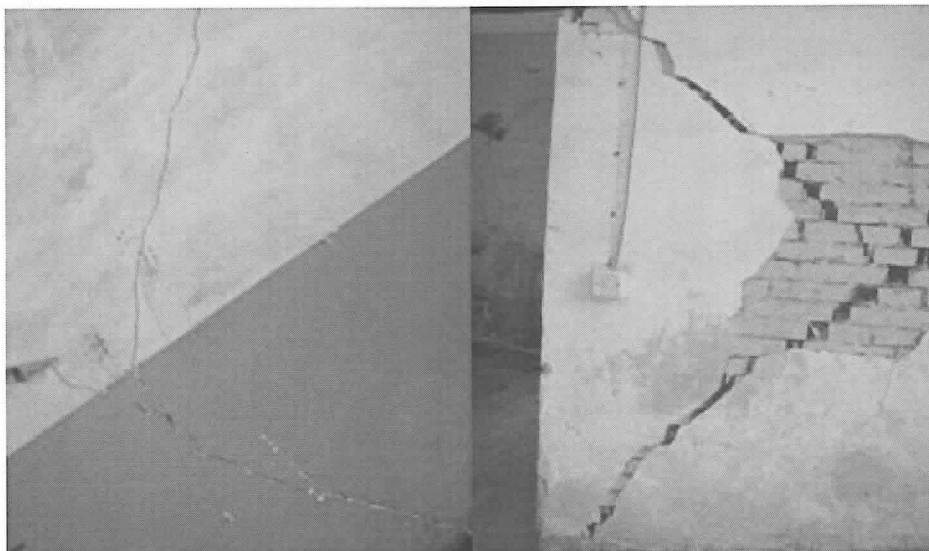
Longitudinal wall and cross wall cracks of the building of a beer company
